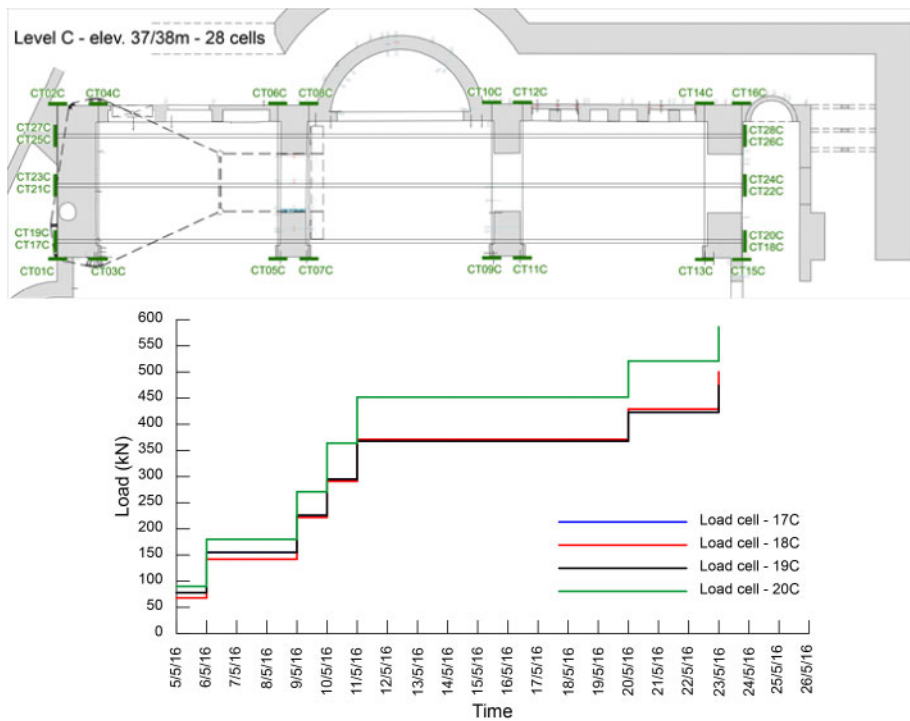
Plan view of the installed load cells and loading steps in the upper and inner chain (level C).
